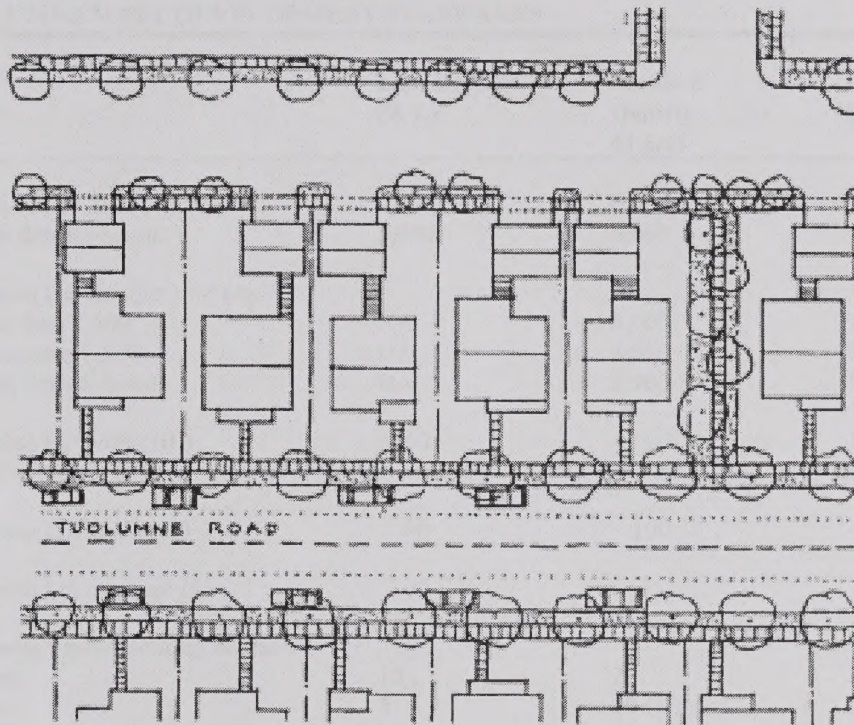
Illustrative Plan. Tuolumne Road Residential Neighborhood.
